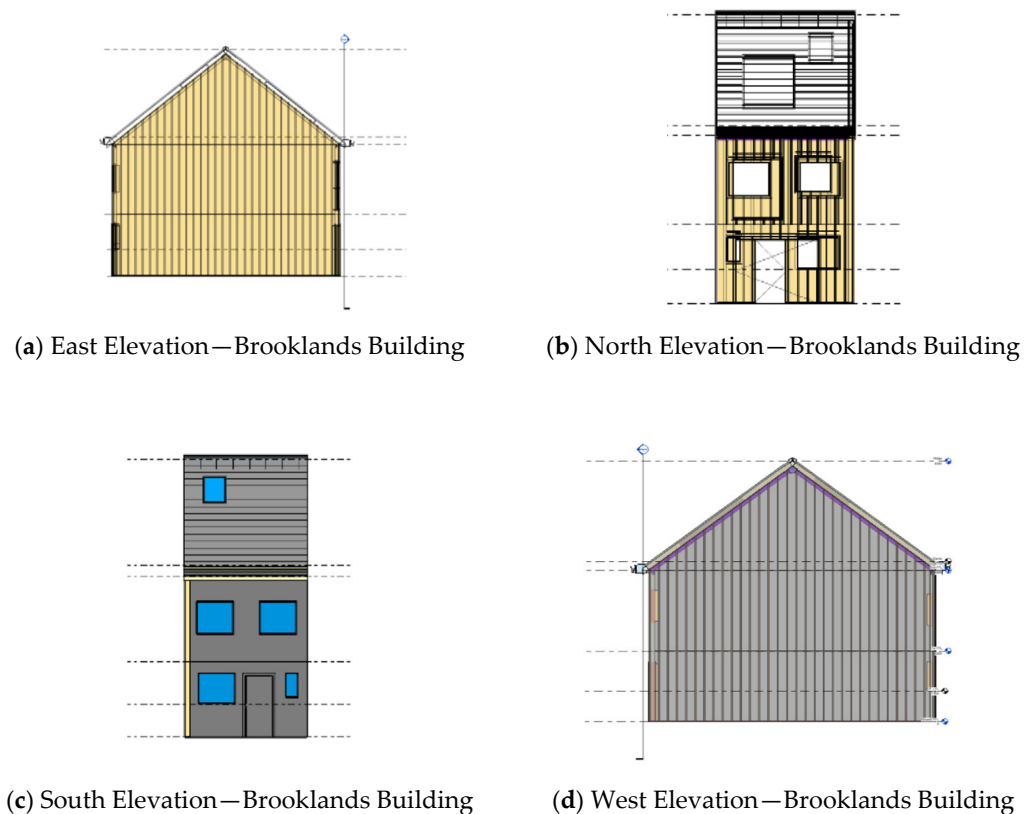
Revit model and drawings—Brooklands Building, Wirral Waters, UK [39].
